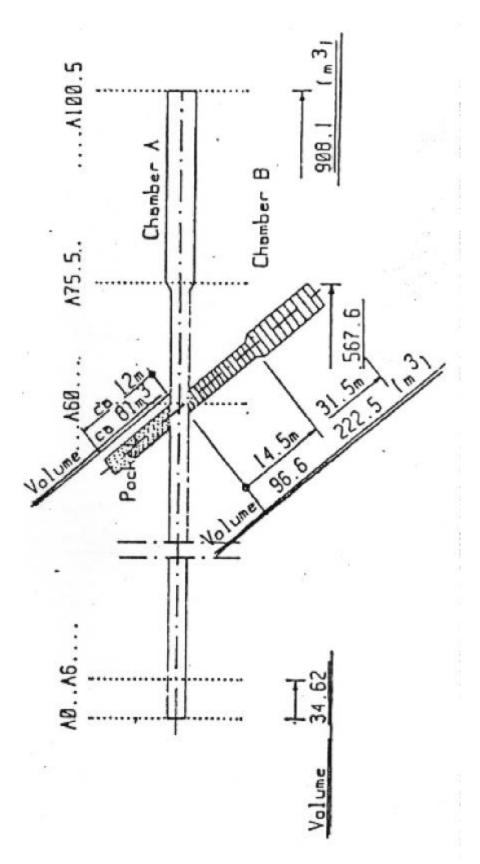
Test site layout for KLOTZ Club Tests 7, 8, 9, Älvdalen, Sweden.
